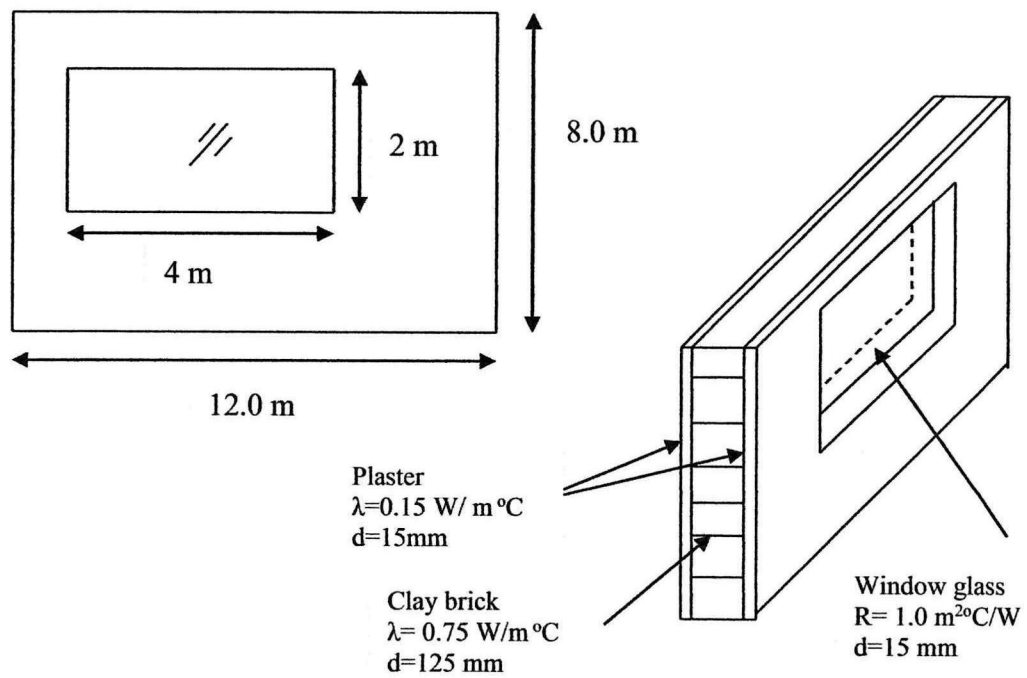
Wall for an Office Building in Parit Raja, Batu Pahat
